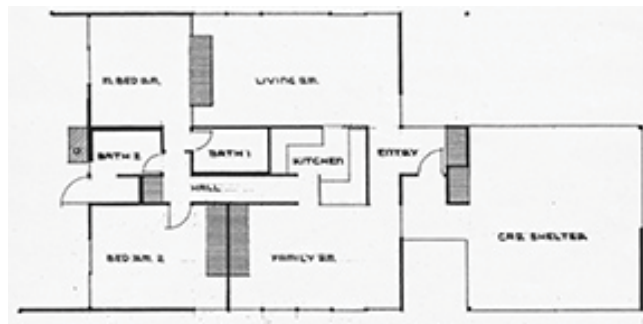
Alexander House, Floor Plan (2 bed, 2 bath)
